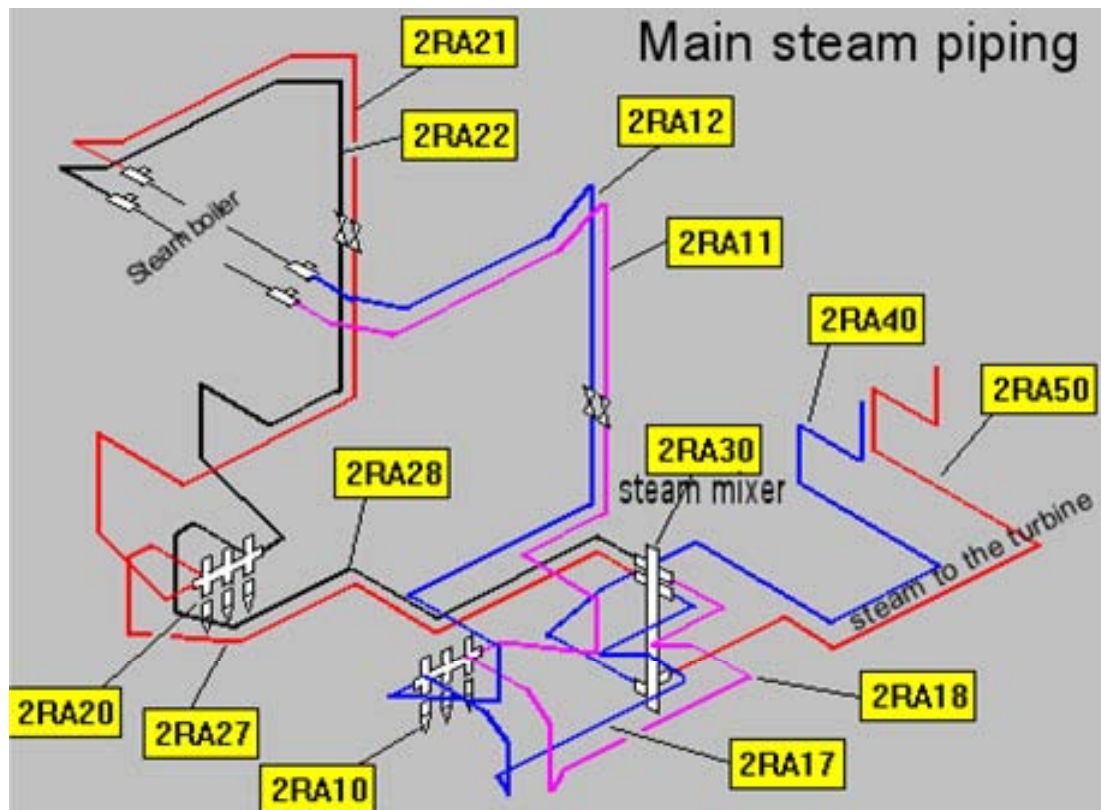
Layout of the steam piping of unit 2 with the mixing header 2RA30.
